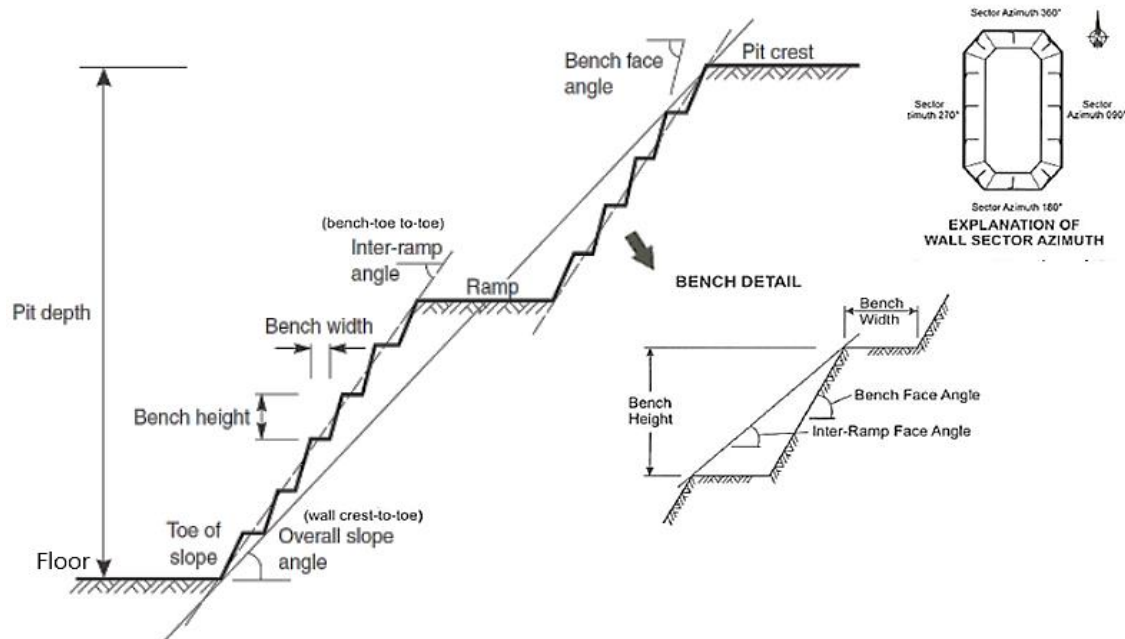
Open pit wall terminology (adapted from Martin and Stacey 2018, Wyllie and Mah 2005)
